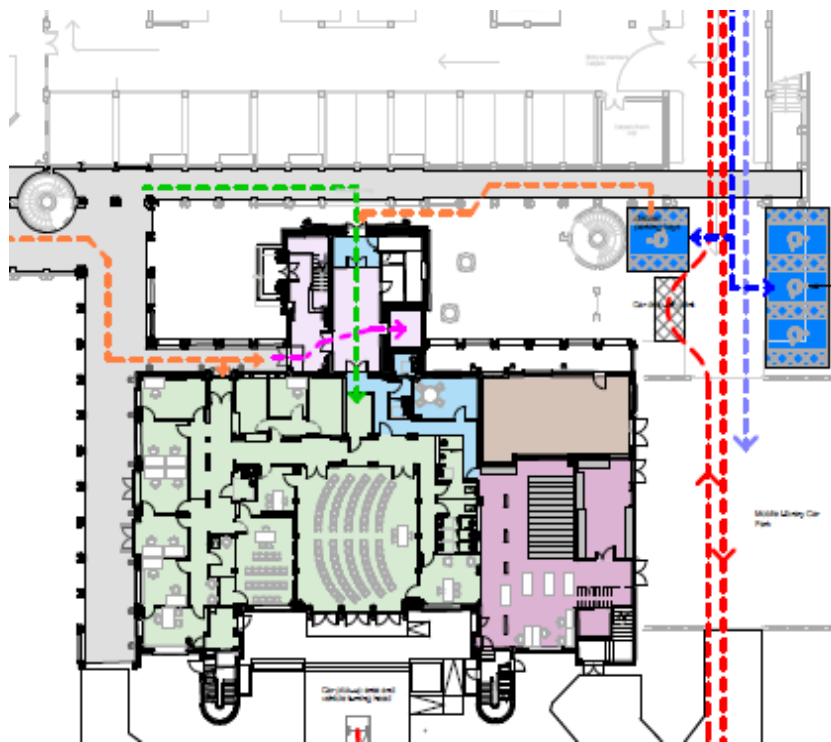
Proposed Parking Layout Level 1 - (please note- larger vision of plans can be found in the Committee Plan Pack)
